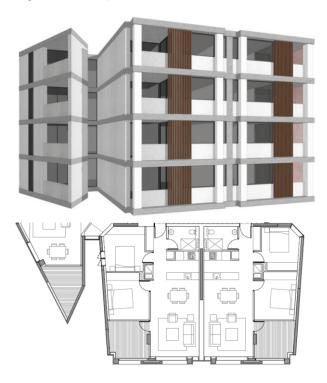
North eastern façade detail of Building C1 detailing irregular balconies
